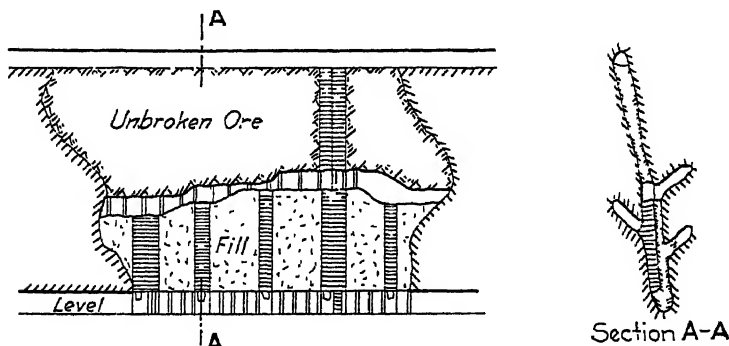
CUT-AND-FILL STOPE, WORKED BY BACK-FILLING METHOD, FILL OBTAINED FROM WASTE RAISES IN BOTH WALLS, STOPE PARTLY TIMBERED, CRIBBED CHUTES AND MANWAYS.
